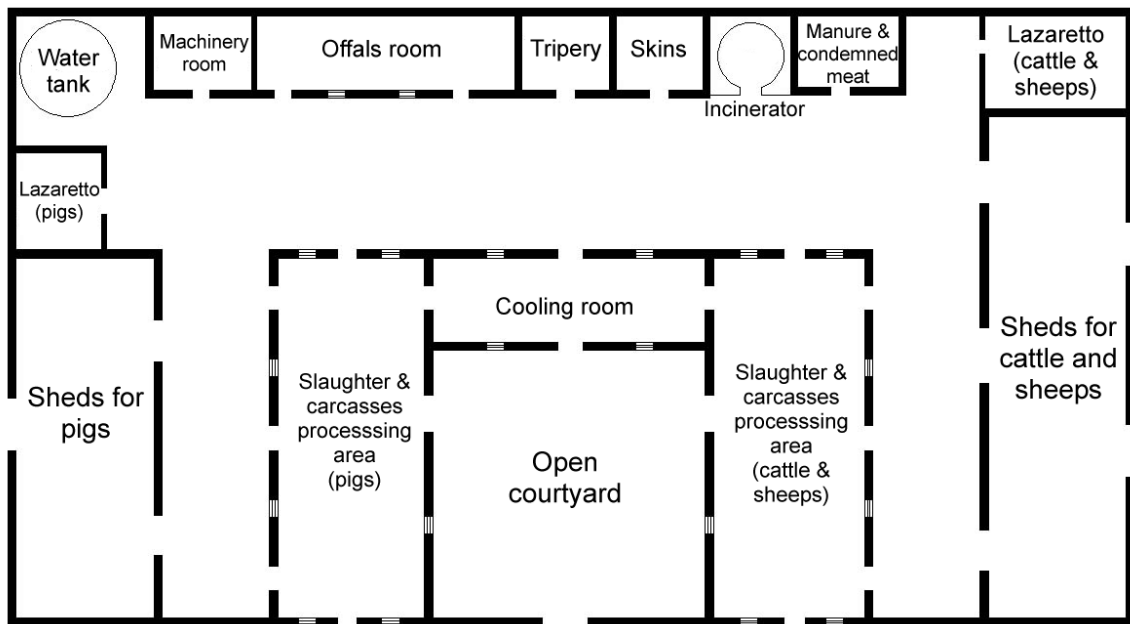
Typical plan design of a municipal slaughterhouse.
